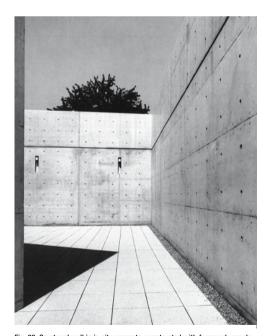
Courtyard wall in in situ concrete, constructed with formwork panels the size of tatami mats (91 x 182 cm), courtyard floor finished with precast concrete flags Tadao Ando: Vitra conference pavilion, Weil am Rhein (D), 1993
